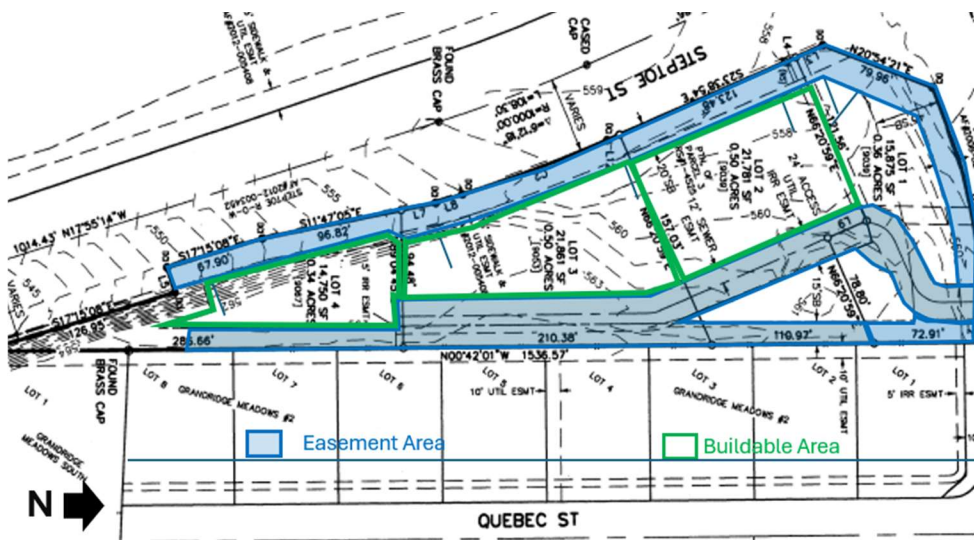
B: Buildable Area Under C-2 Zoning Setbacks
